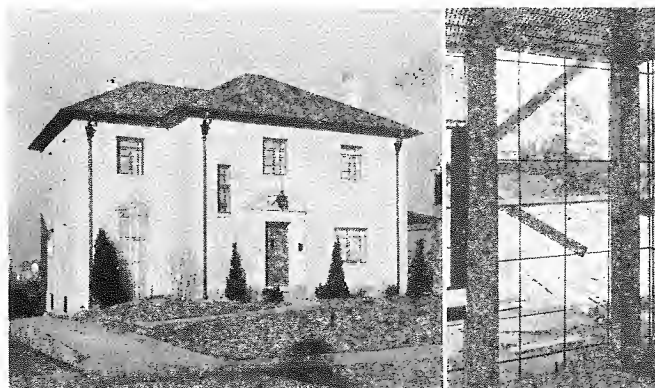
A and B. Modern House with Metal Lath Used In Combination with Reinforced Concrete Structural Frame.
